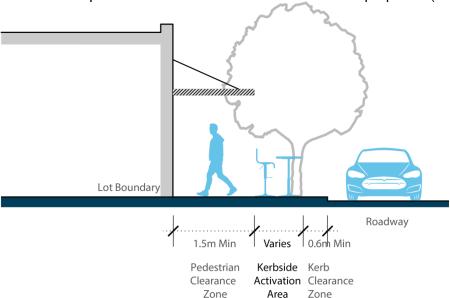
Kerbside Activation Area - Footpaths 3.5 Metres Wide or Greater
